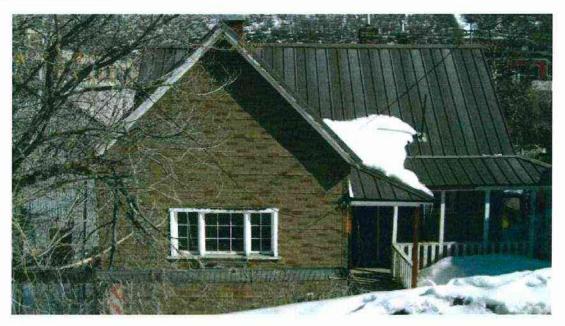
East Elevation Porch Ceiling and Support Structure Detail
